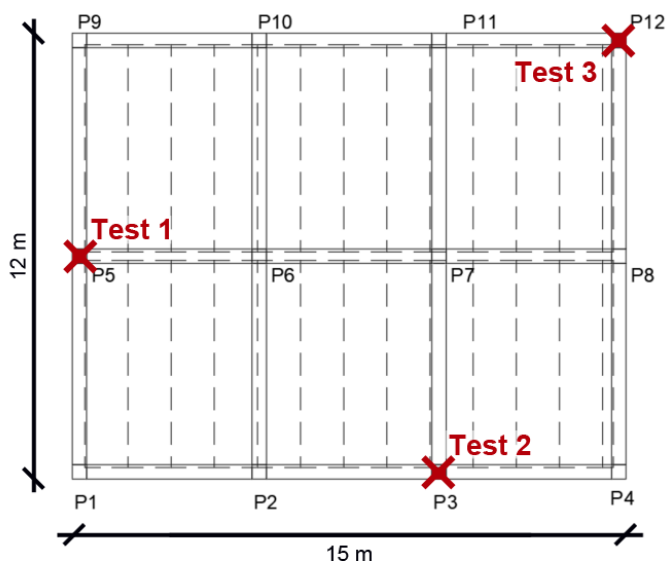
Schematic plan view of test building and location of columns to be removed for each test scenario.
